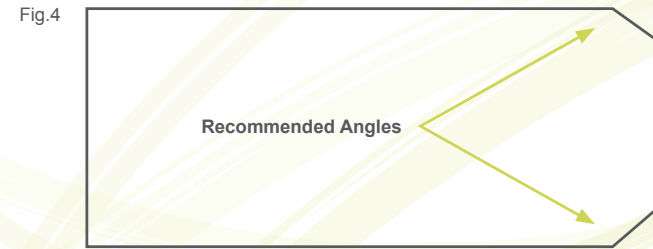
shows a plan view of the outside perimeter of a rectangular shaped compound showing two of the recommended angles.
